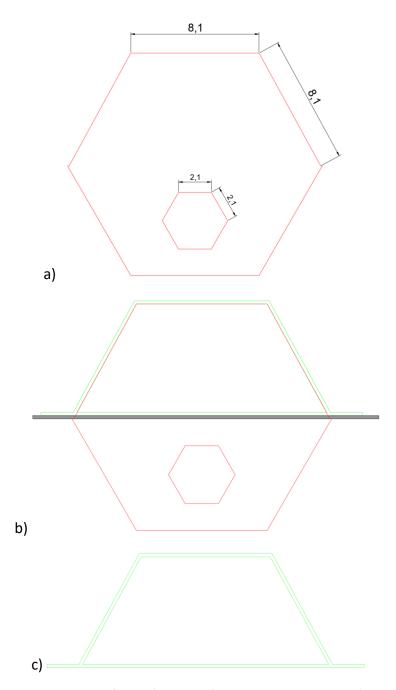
Detailed drawings of the: a) Dowel of the StrongJoint joints; b) Dowel and sleeve assembly; c) Sleeve
